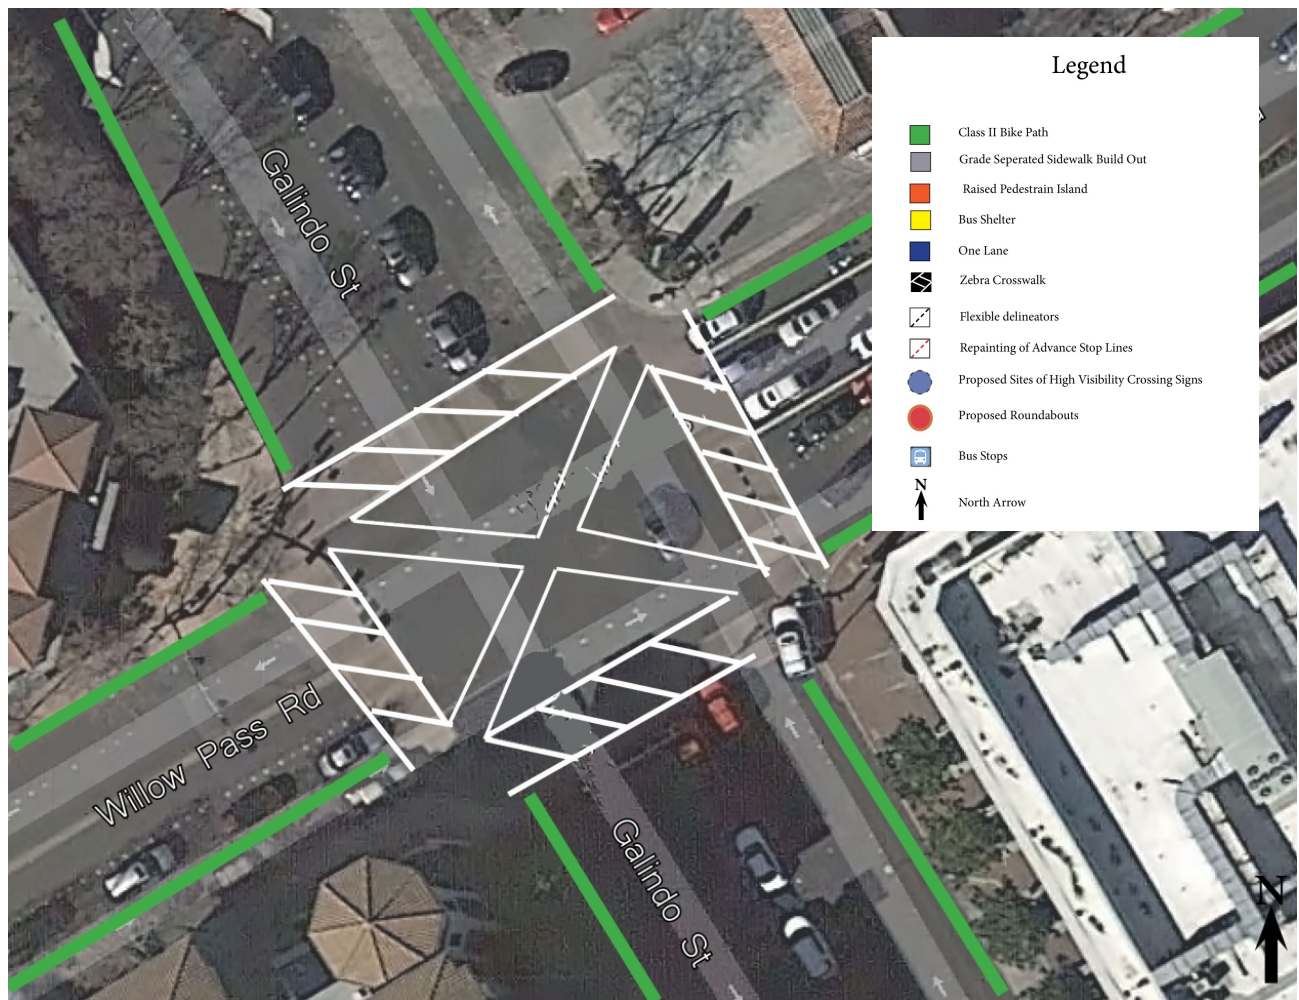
Willow Pass Road and Galindo Street Intersection
